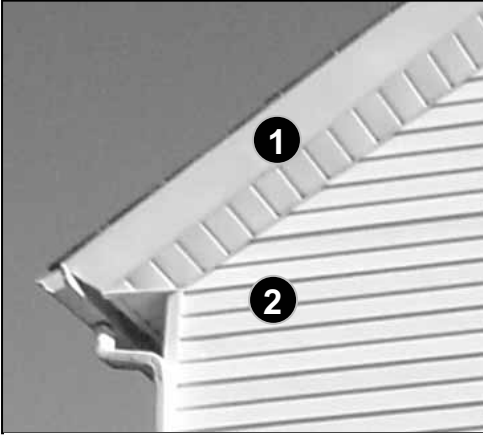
115 McKinley St. Vinyl siding conceals the original trim design of the façade.
